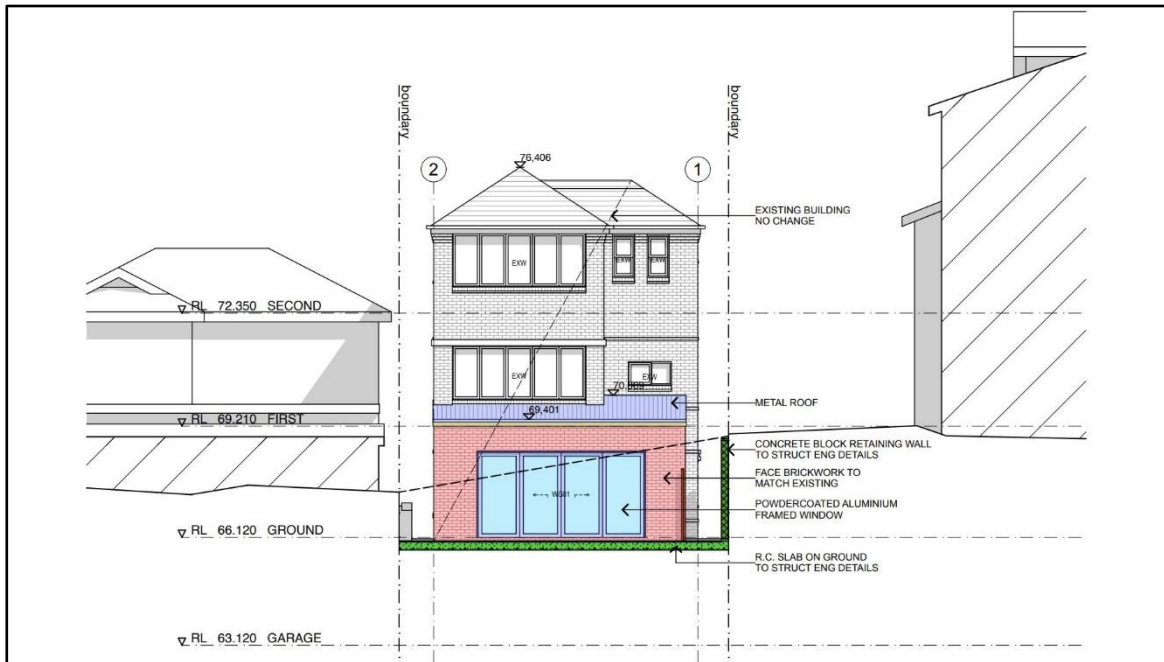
Rear / North Elevation (Rev B), 2/11/2023 (Fortey & Grant Architecture)
